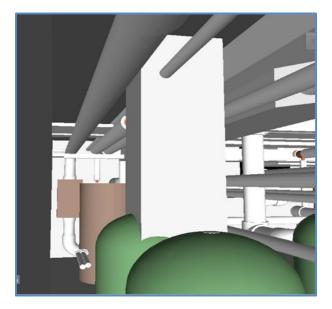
M+E water tanks clashing with structural concrete column highlighted by clash detection
